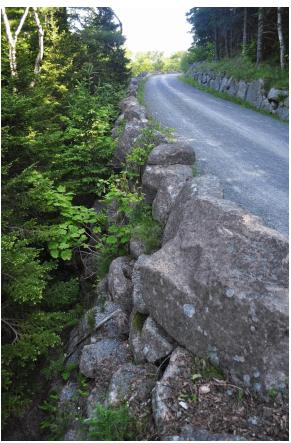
Retaining wall (image right) and guardwall/retaining wall (image left) on CR 10s-14. (Trip 1, ACAD CR 10s-14_0.9756, DSC_4687, SUNY-ESF, 2012)
